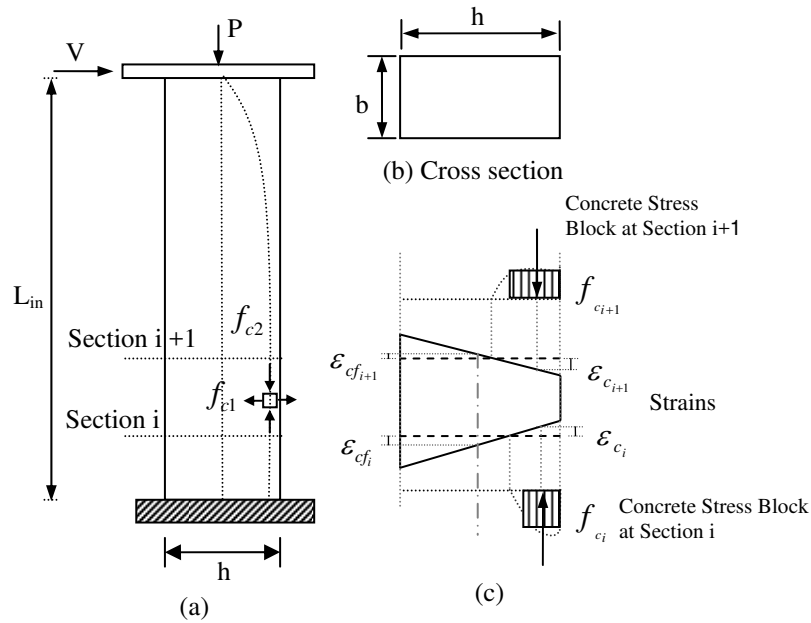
A reinforced concrete column subjected to shear and axial loads; a) Concrete principal compression stress pattern, b) Cross section, and c) Stress blocks and strains at two adjacent sections.
